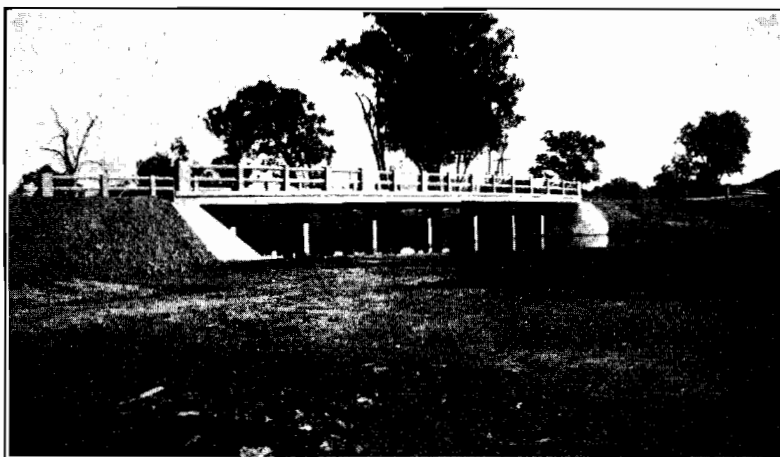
Showing new bridge erected on the Kiewa River Flats at Bonegilla.
